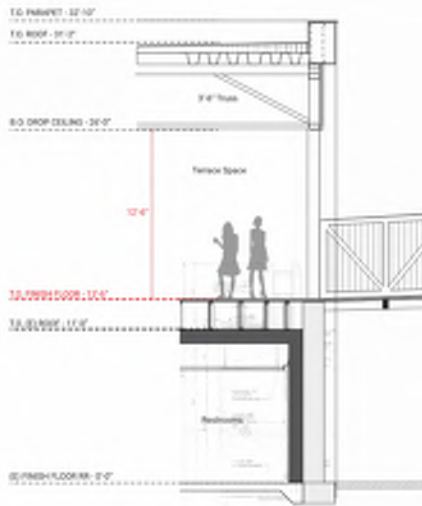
Section of proposed Artists Pavilion (Restroom #4 below)
